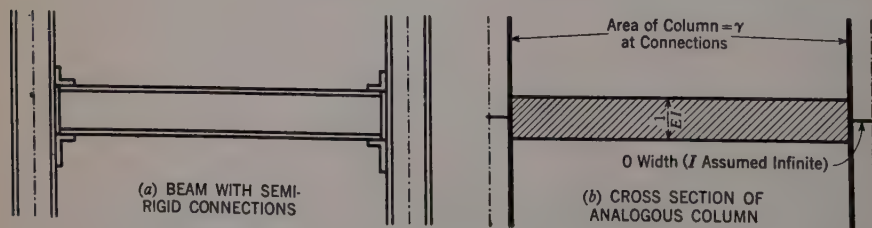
APPLICATION OF COLUMN ANALOGY TO BEAMS WITH SEMI-RIGID CONNECTIONS
